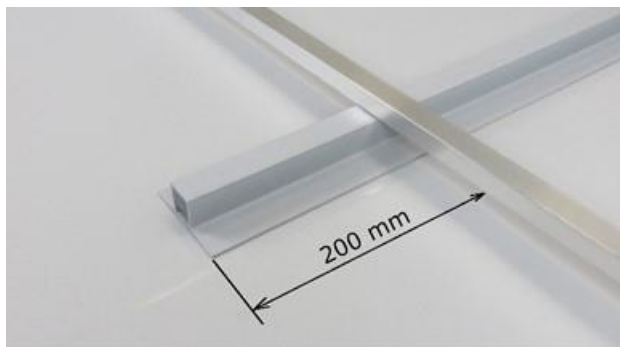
Minimum overlap of FATRAFAST edge profiles against the installed structure
